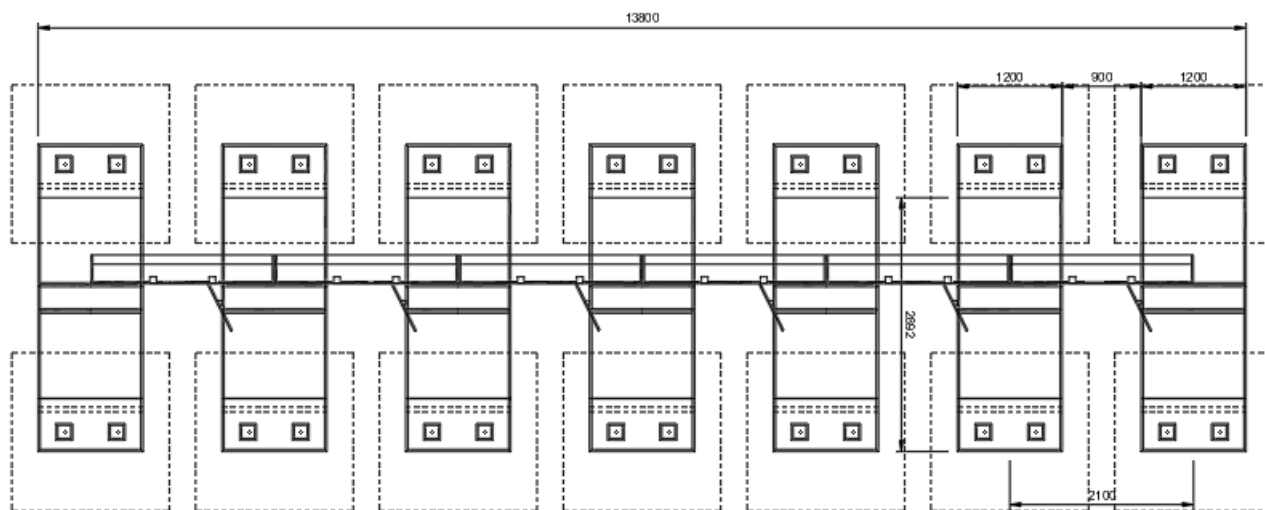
Plan view of the Wall structure with 7 No of PC Wall Elements
